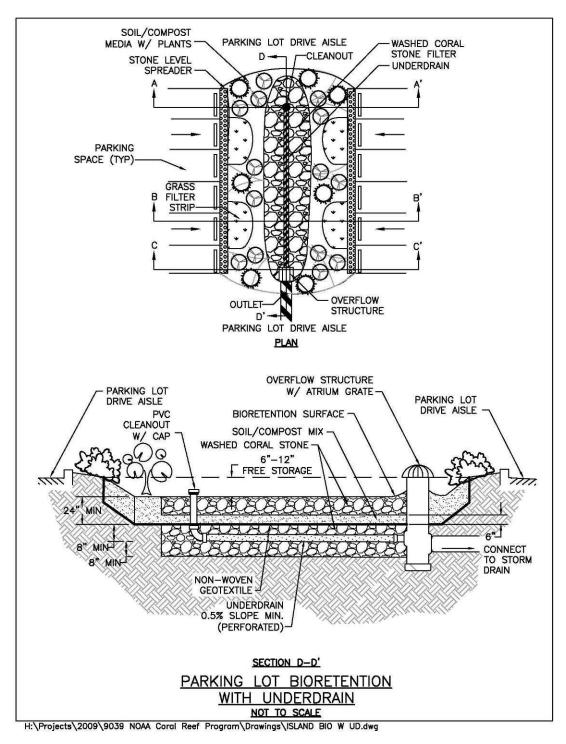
Plan view and longitudinal section for <u>filter</u> design version (includes underdrain).
